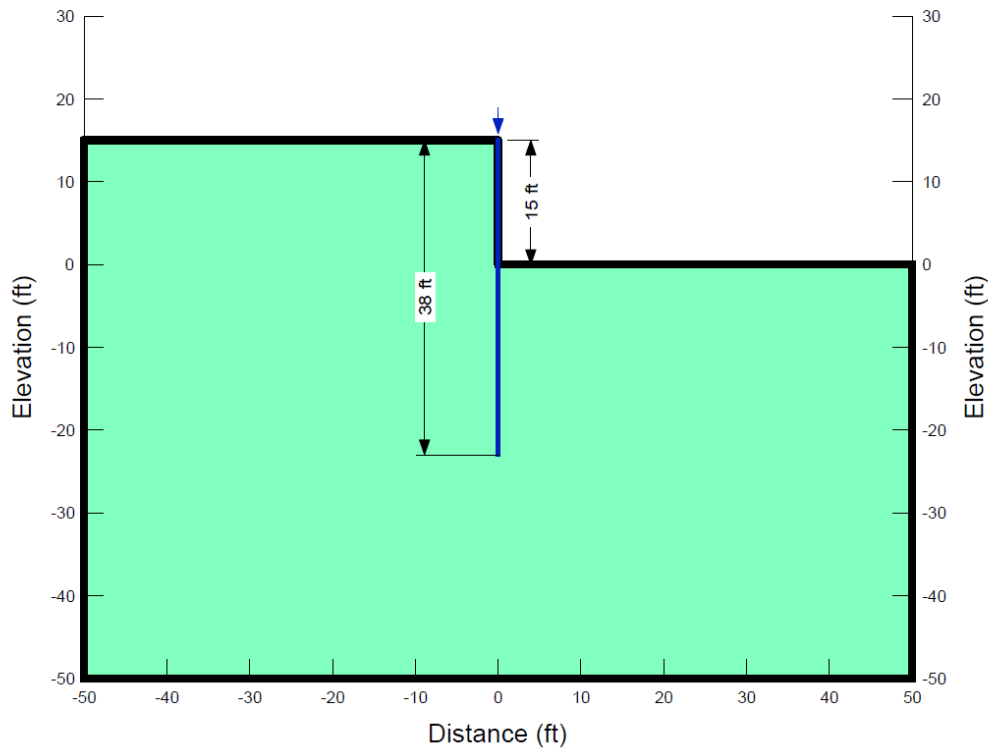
Schematic view of Cantilever Wall analysis section.
